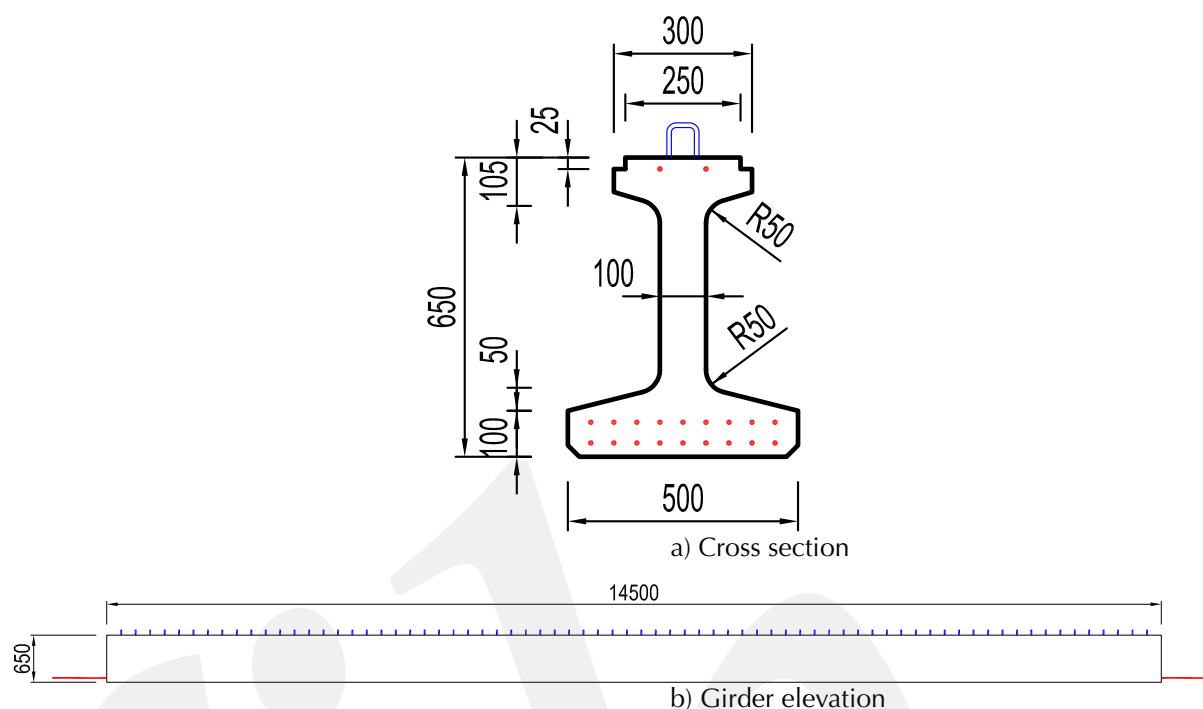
Cross section of I-girder and girder elevation. Note: All dimensions are in millimeters. 1 mm = 0.0394 in
